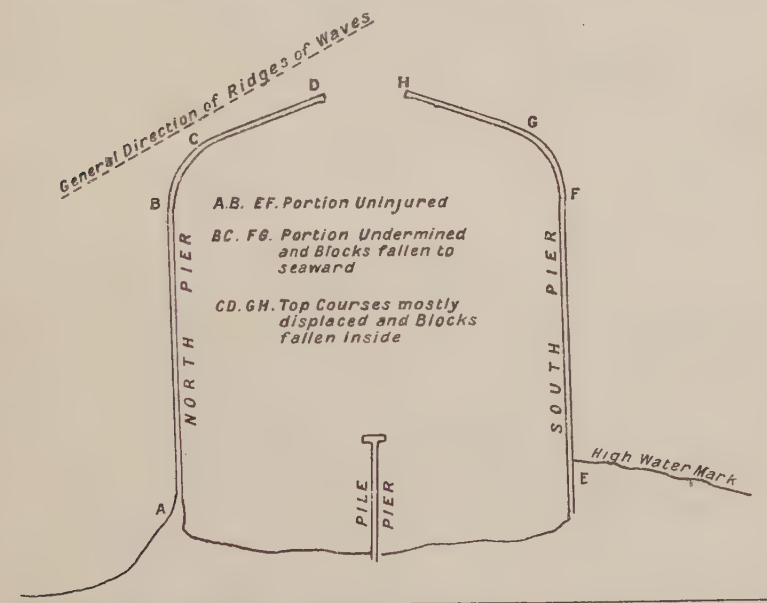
Madras Harbour. Sketch showing extent of damage done by storm of 12th November, 1881.
